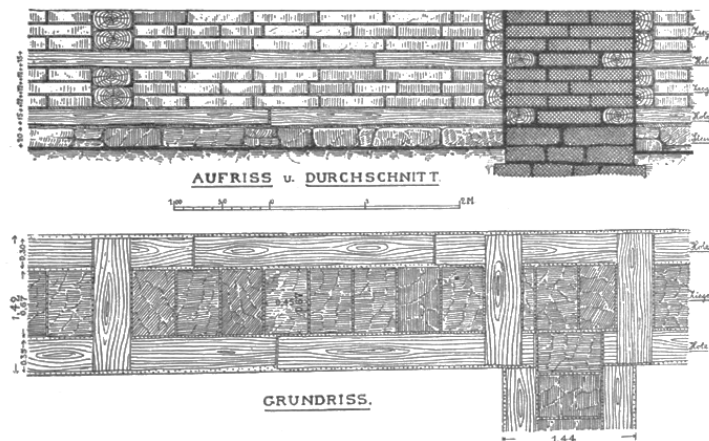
Troia, Megaron IIA in Level II, inner room, mudbrick masonry wall with horizontal timber beams, placed parallel and vertical to the wall faces, forming a two-dimensional levelling and structural strengthening grid [10]. The mudbrick walls were 1.49m thick. The timber beams were c. 30-35cm wide and c. 15cm high, located at an interval of three courses of bricks with two beams placed vertical to the wall face in each interval. The transverse beams perpendicular to the wall faces were located at c. 4m intervals. The beams were connected at the wall corners.
